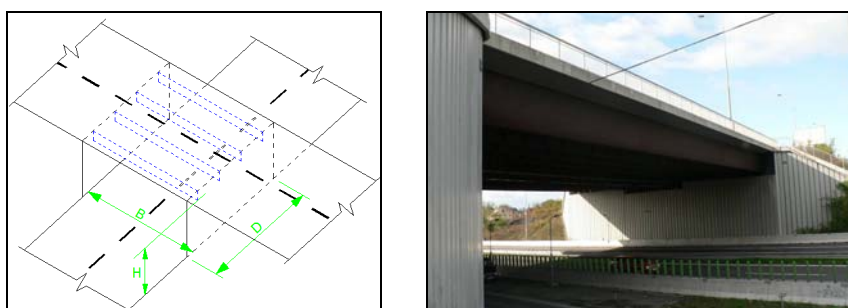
Bridges with limited ventilation over the road: left - the scheme, right - a typical example of a bridge structure where chloride sediments should be taken into account (road and tram bridges over the D1 Motorway in Ostrava, Czech Republic – built in 2002).
